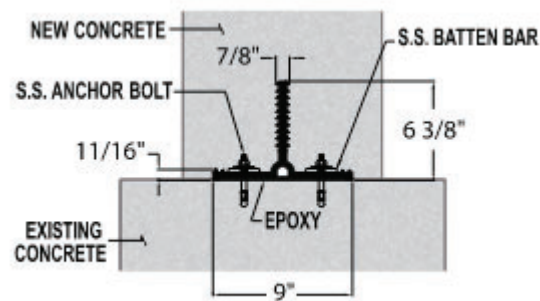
Proposed Retrofit PVC Waterstop Detail
